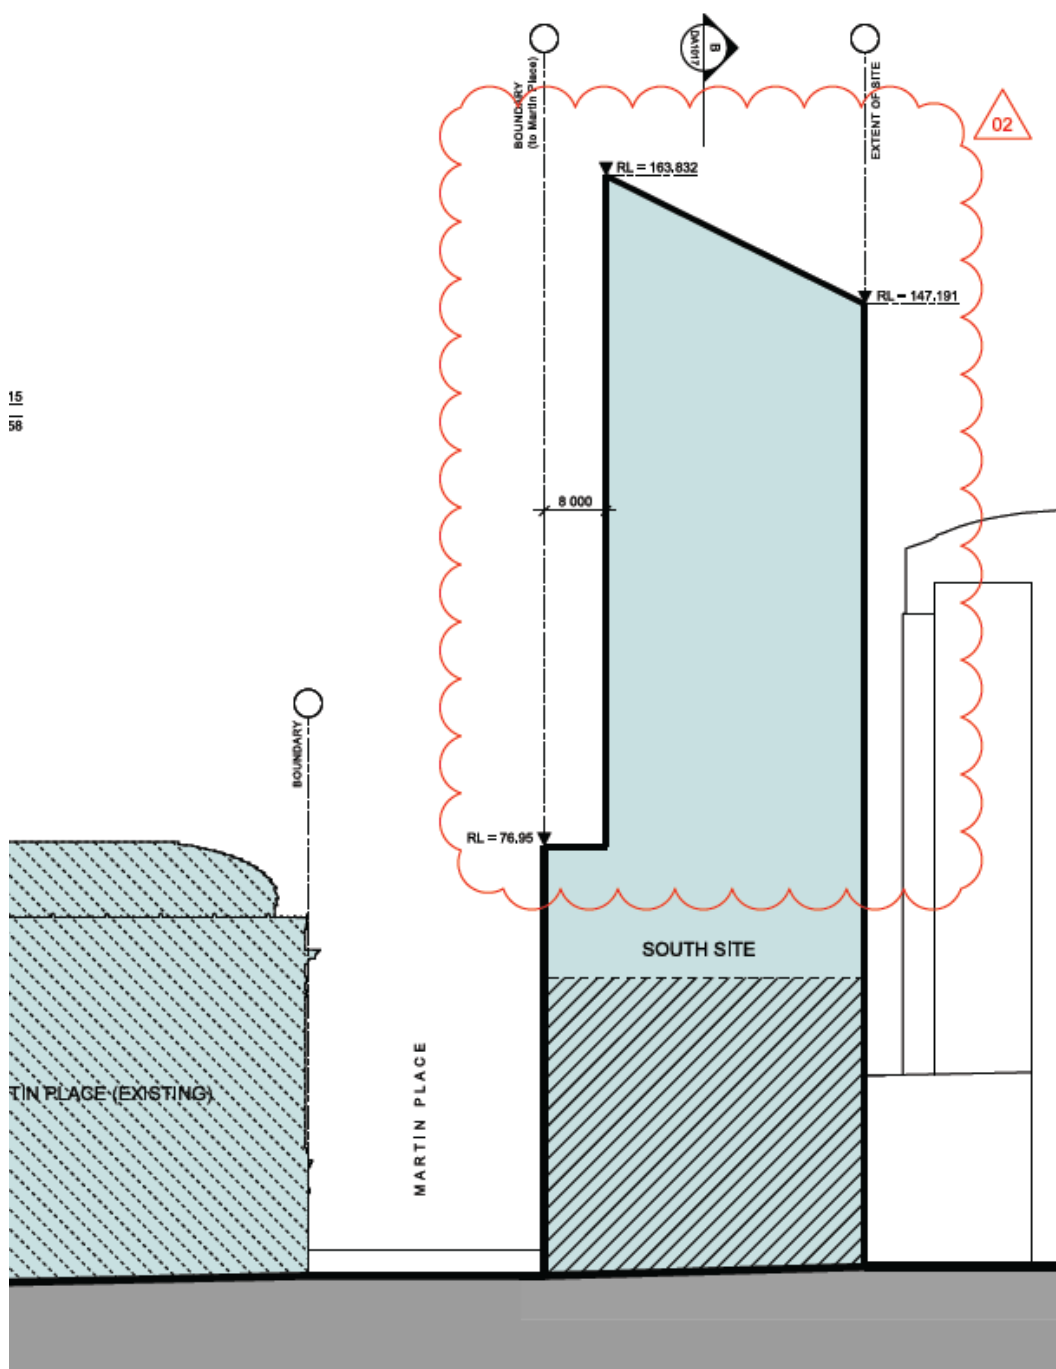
Proposed South OSD tower building envelope, western elevation (amendment clouded red)
